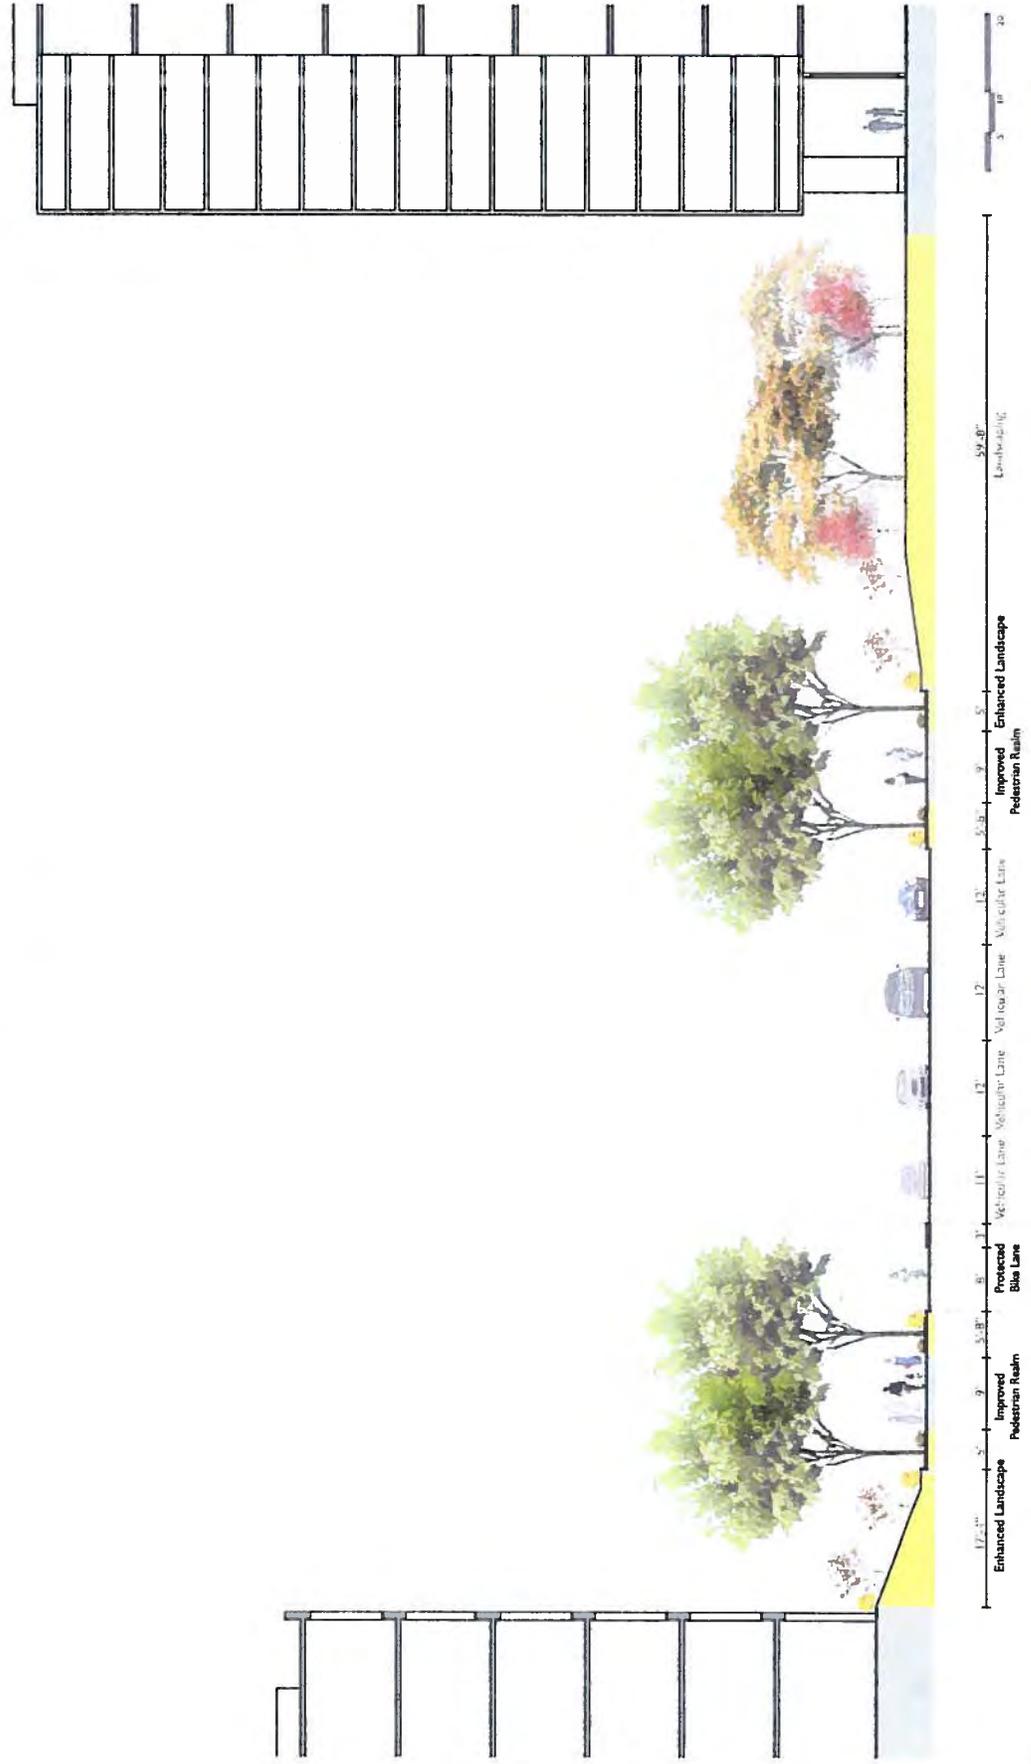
Proposed Clayton Road section at Galindo Street
